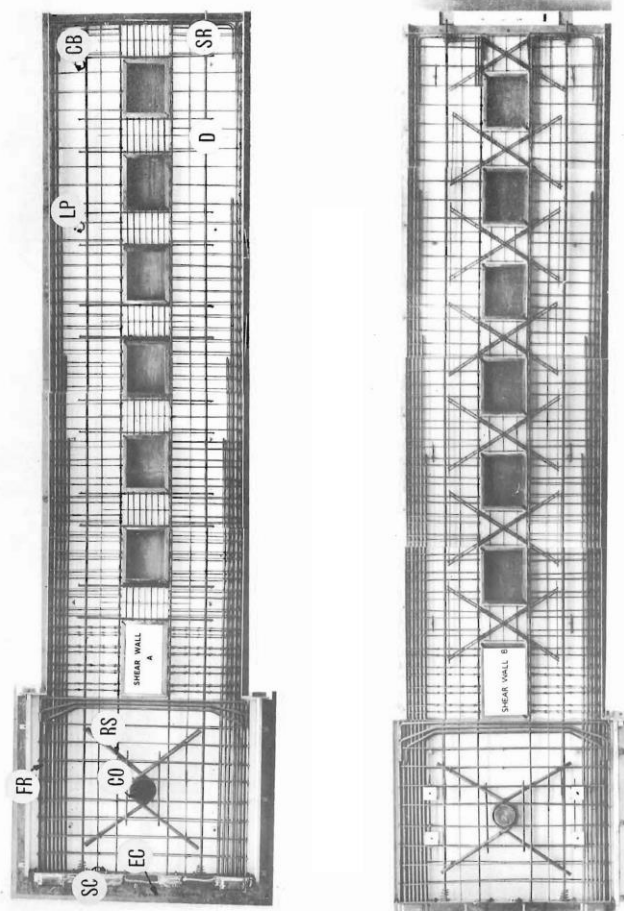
Reinforcement configuration of Santhakumar's (1974) 7-story coupled wall system specimens; left shows Wall A with a conventional reinforced coupling beam, right shows Wall B with a diagonally reinforced coupling beam.
